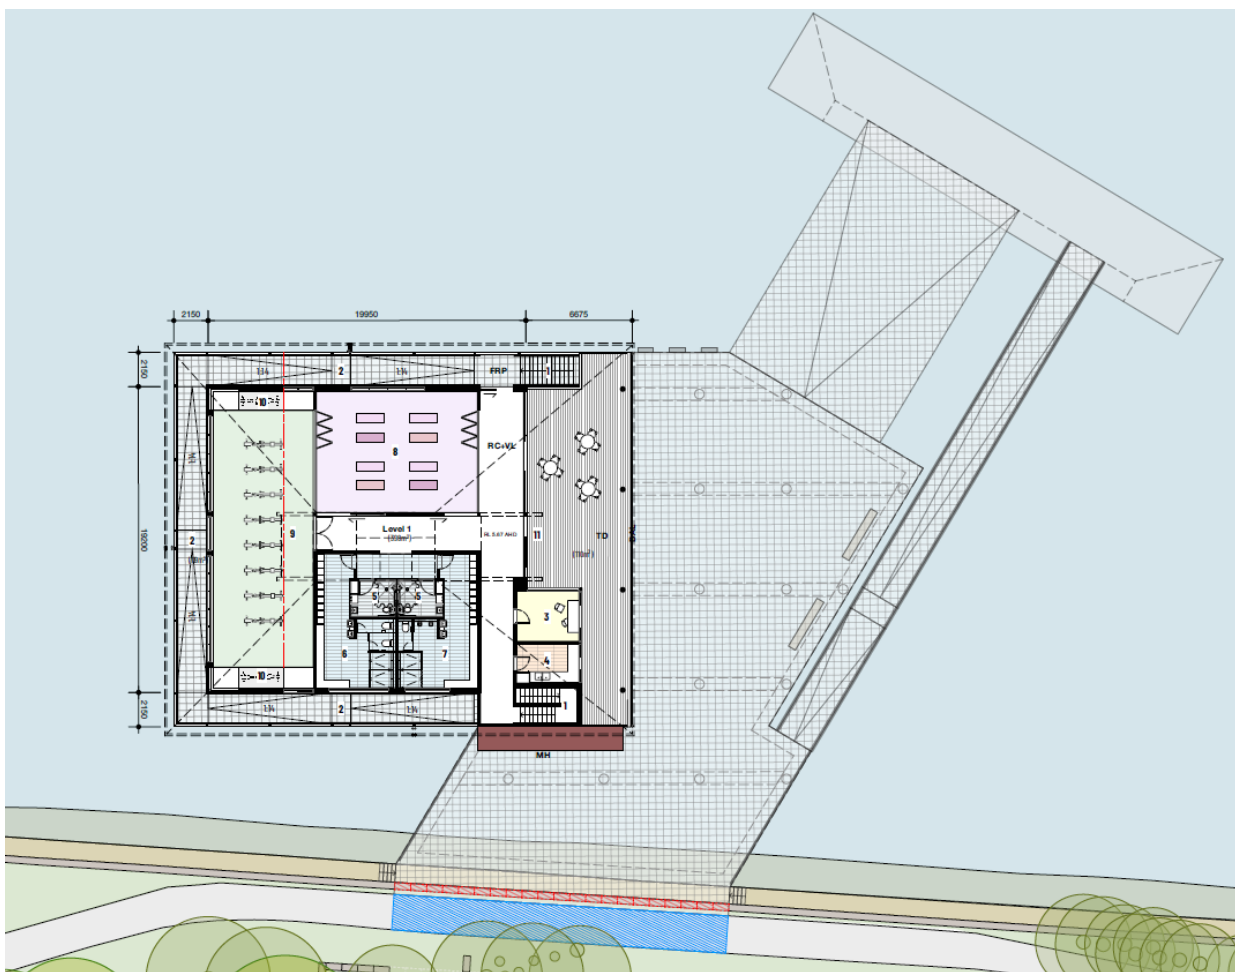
Site, pontoon and ground floor boat shed plan, Hill Thalys
